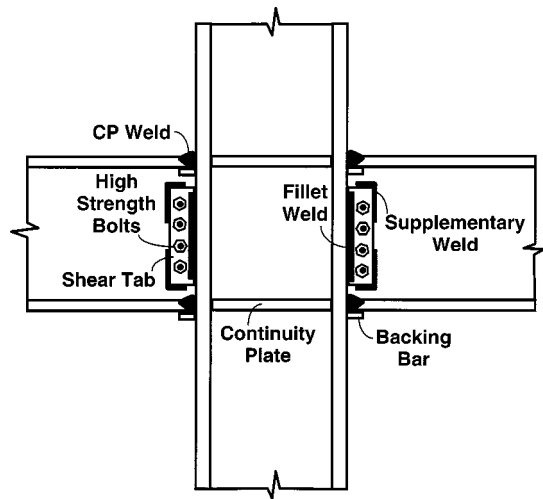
Prescriptive moment connection specified between beam and column in steel moment-resisting frame buildings
